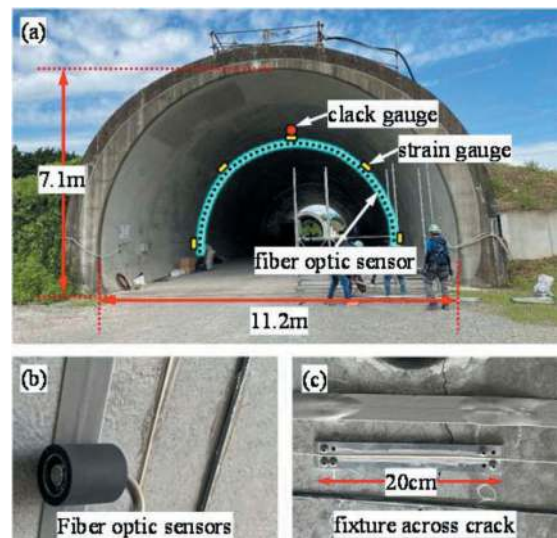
Simulated road tunnel: (a) sensors layout. (b) Fiber optic sensors. (c) fixture across crack.
